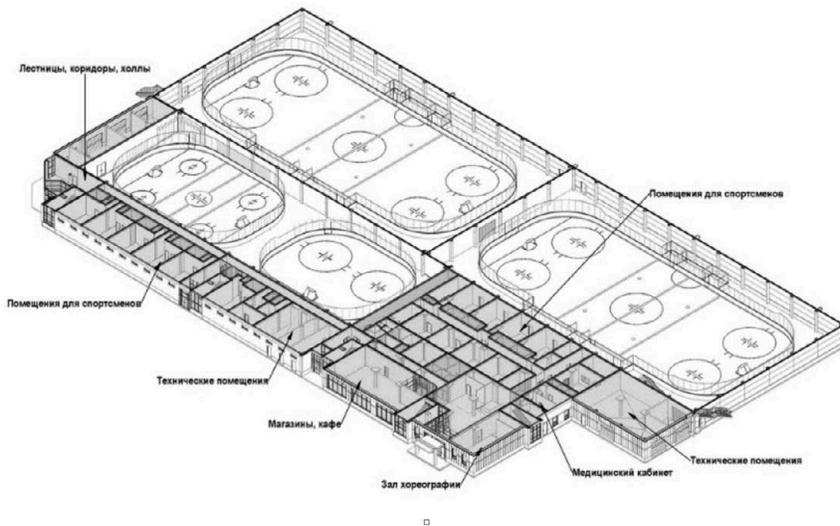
1st floor plan of the ice hockey [1] the process of constructing [1]
